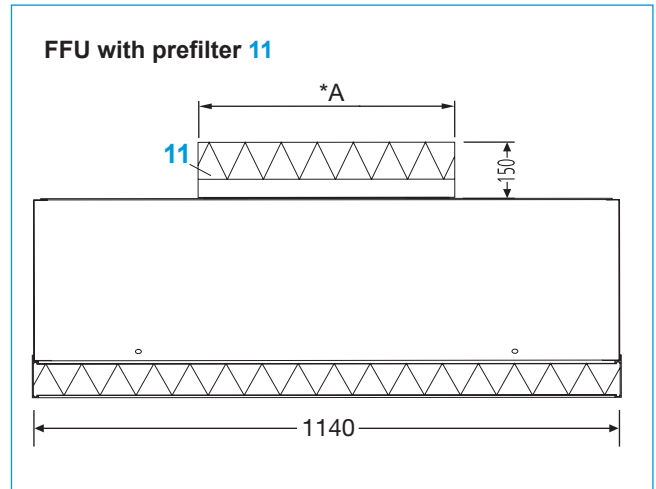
FFU SILENT with accessories, shown on the housing version with locking bolts
